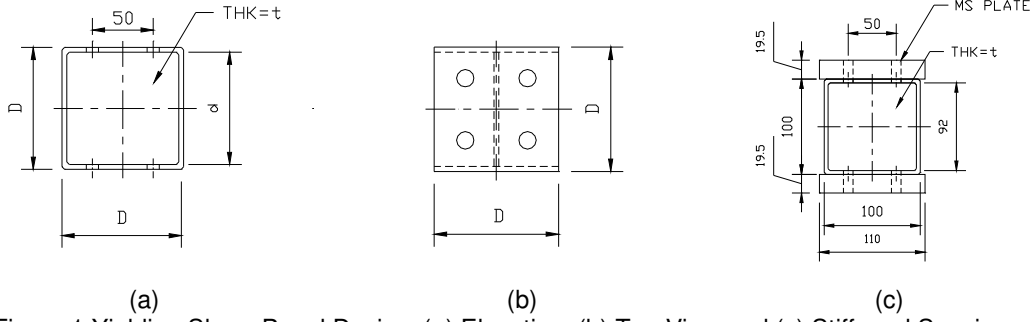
Yielding Shear Panel Device: (a) Elevation, (b) Top View and (c) Stiffened Specimens
